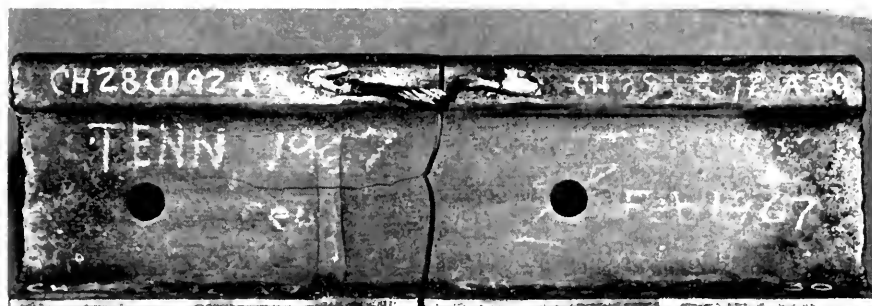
(Investigation 136-34)—Side view of an electric flash butt welded rail joint that failed in service. This failure started at the weld and progressed in a horizontal plane along the neutral axis, then veered toward the head and base in rail CH28C092-A-30. The Cadweld bond noted on the side of the rail head was affixed after the failure occurred to complete the track signal block circuit until the rail could be removed.
